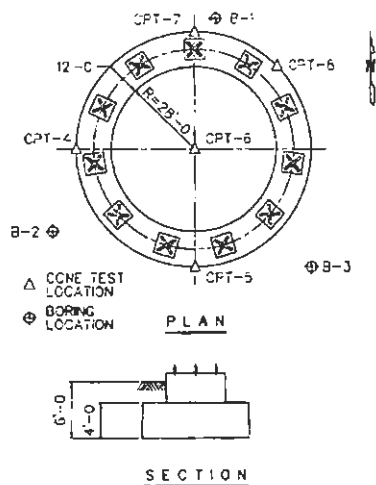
Foundation and site investigation plan (1 ft = 0.305 m)
